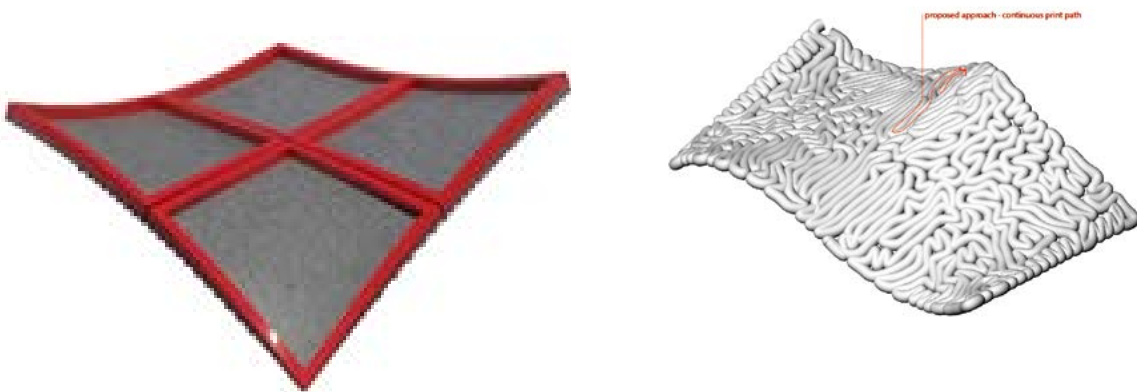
Printing strategies: [left] Printing edges and casting. [right] fully-printed panels
